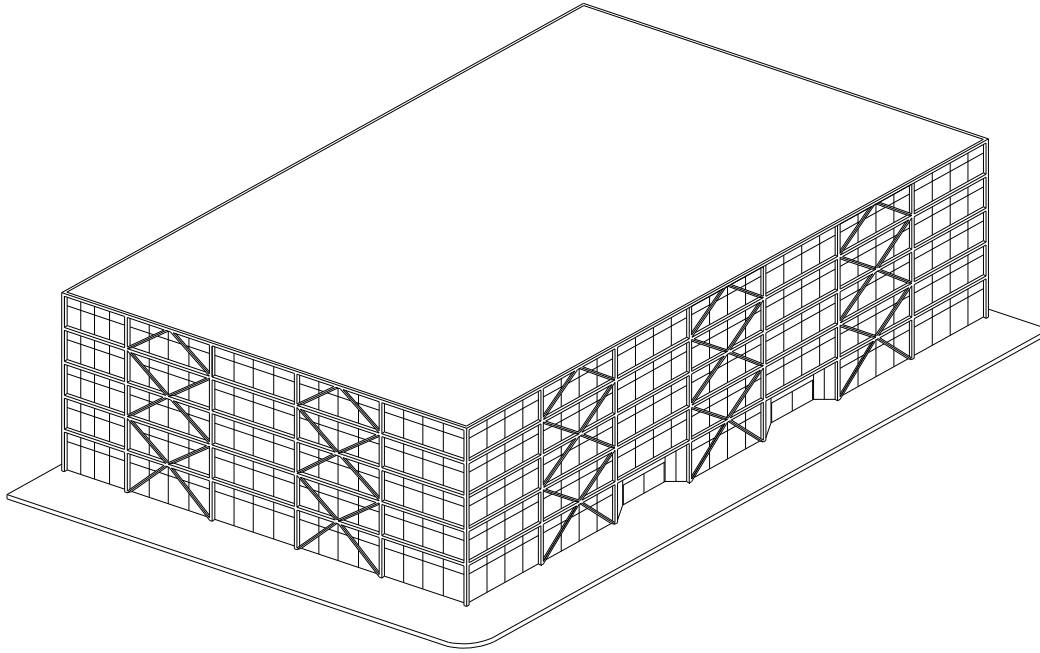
A three-dimensional view of the prototype building used to determine the test specimens design forces.
